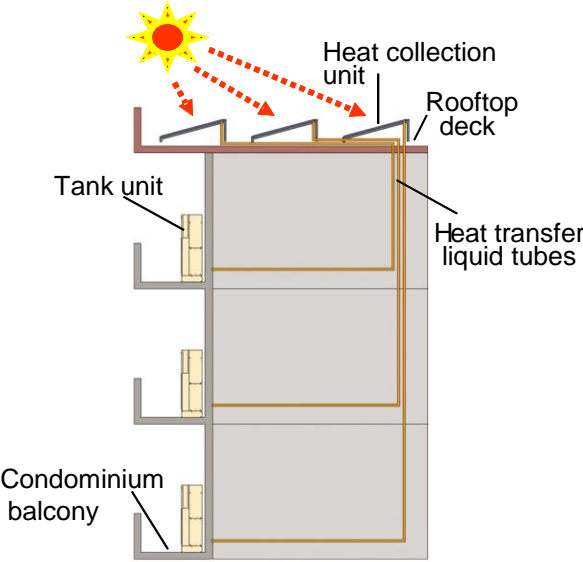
Image of SOLAMO system that has heat collection units for resident private use installed on the rooftop deck of a condominium
